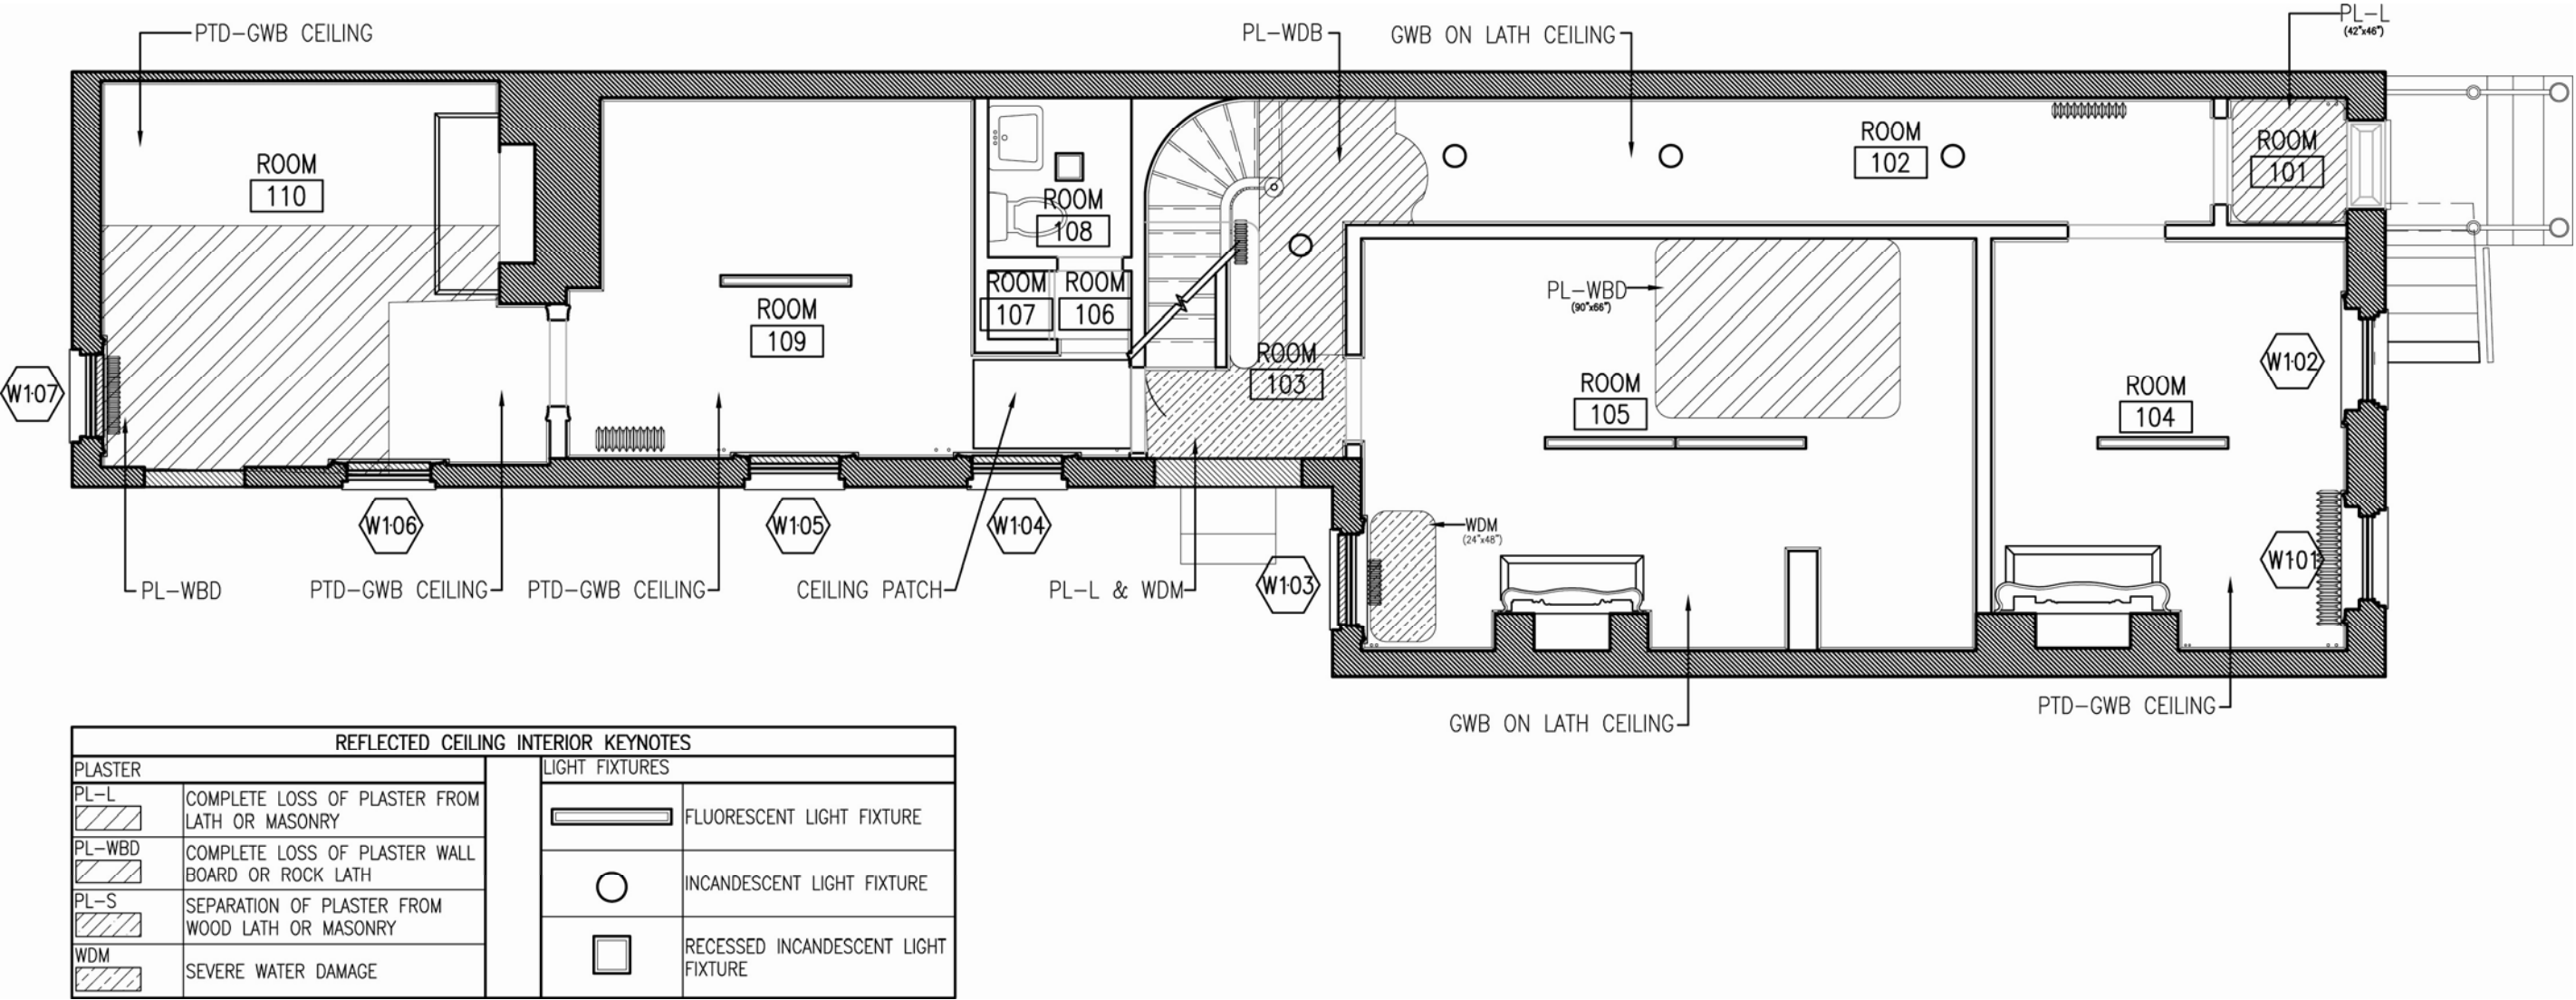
First Floor Reflected Ceiling Plan – Interior Conditions Assessment
